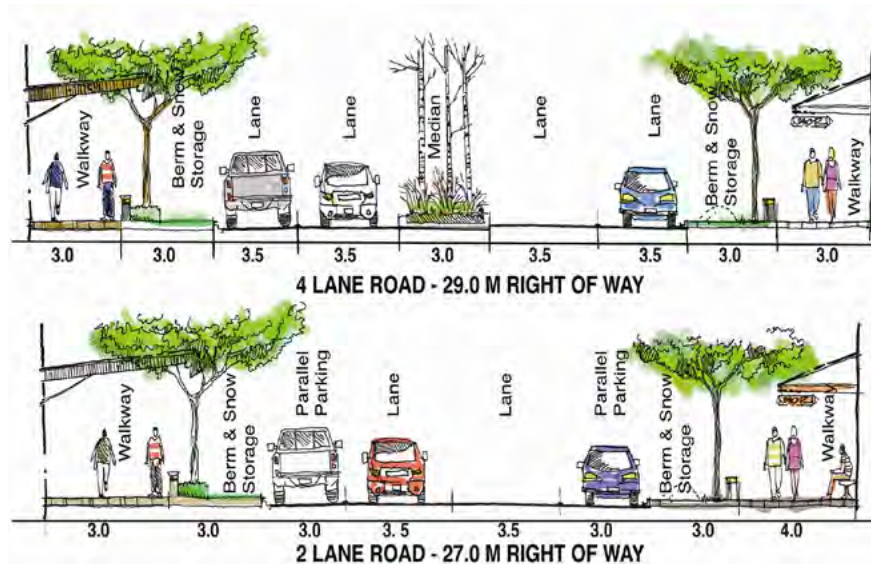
CONCEPTUAL CROSS SECTIONS OF INTERNAL ROADS, SKETCH BY DANIEL LEAL
